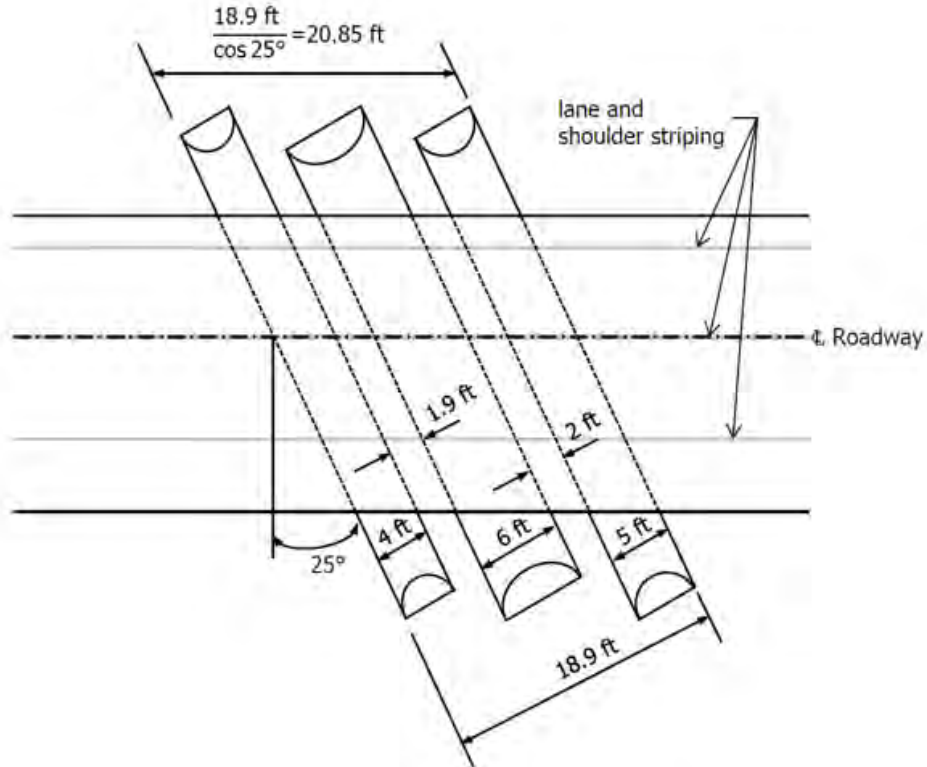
Plan view of a skewed, multi-pipe culvert under fill (Example 3)
